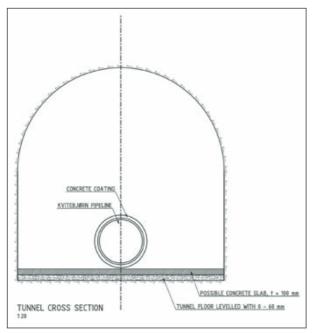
Cross-section of landfall tunnel. (Illustration: Statoil / Norconsult)
